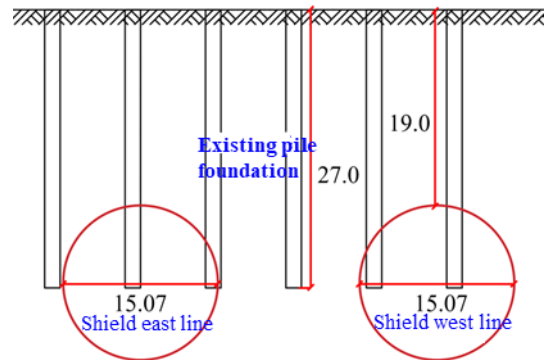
Engineering diagram of Haizhu Wan Tunnel shield section
